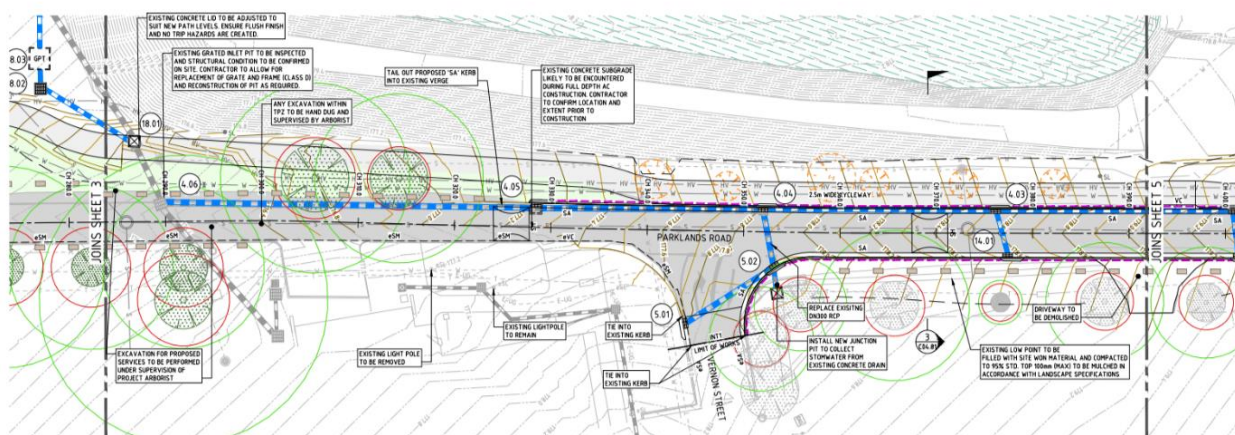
Parklands Road: Adjoining upper dam (Source: Northrop)
